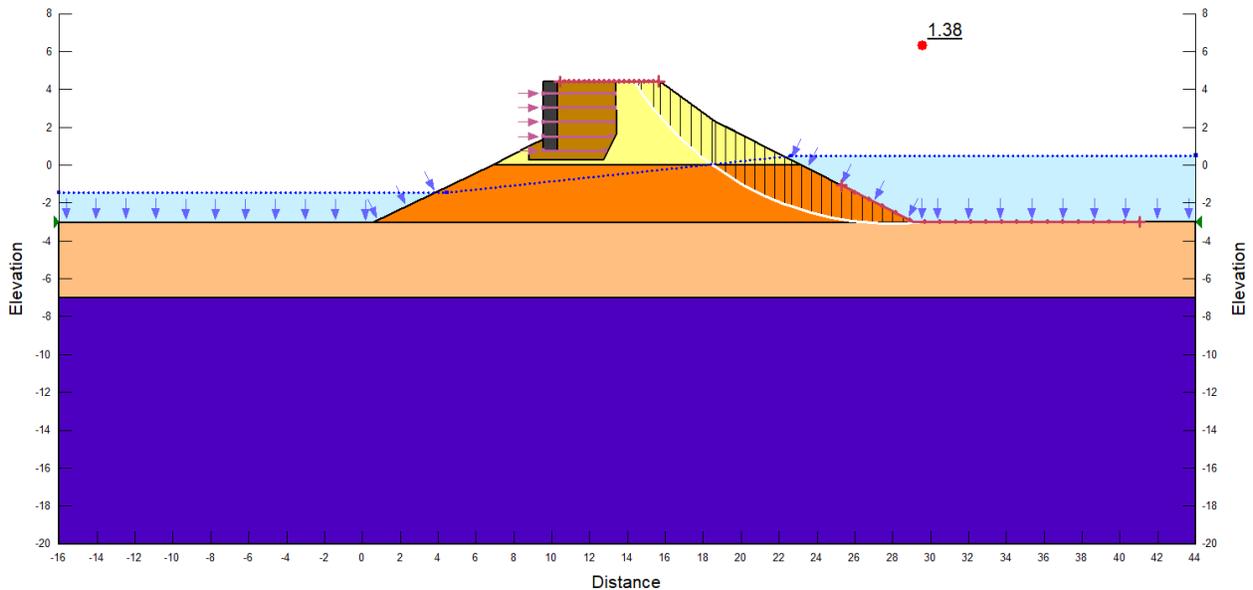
Riverward stability of dike at flood box after raising to El. +4.4 m.
